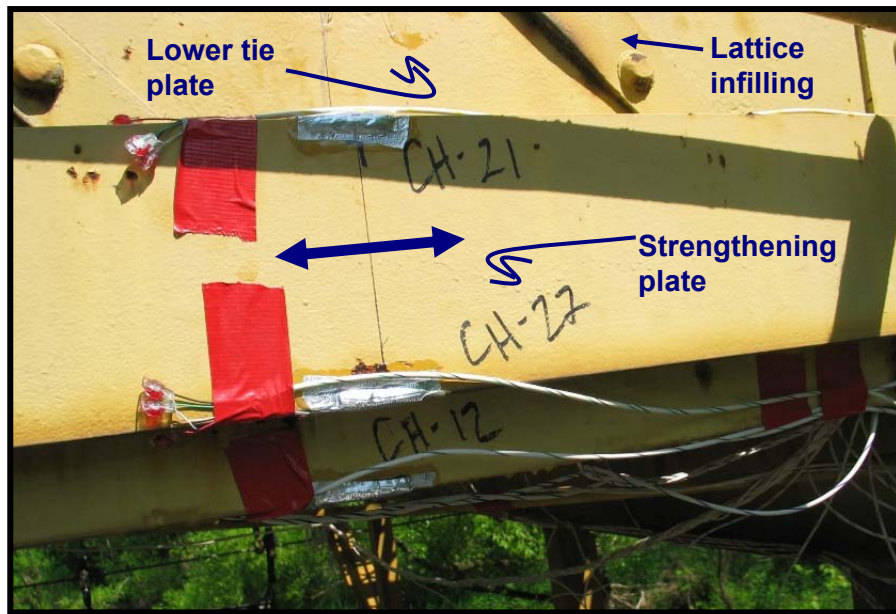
CH\_21 and CH\_22 installed on the top and bottom edges, respectively, of the strengthening plate and CH\_12 installed on the bottom edge of the existing tie plate (View looking west)
